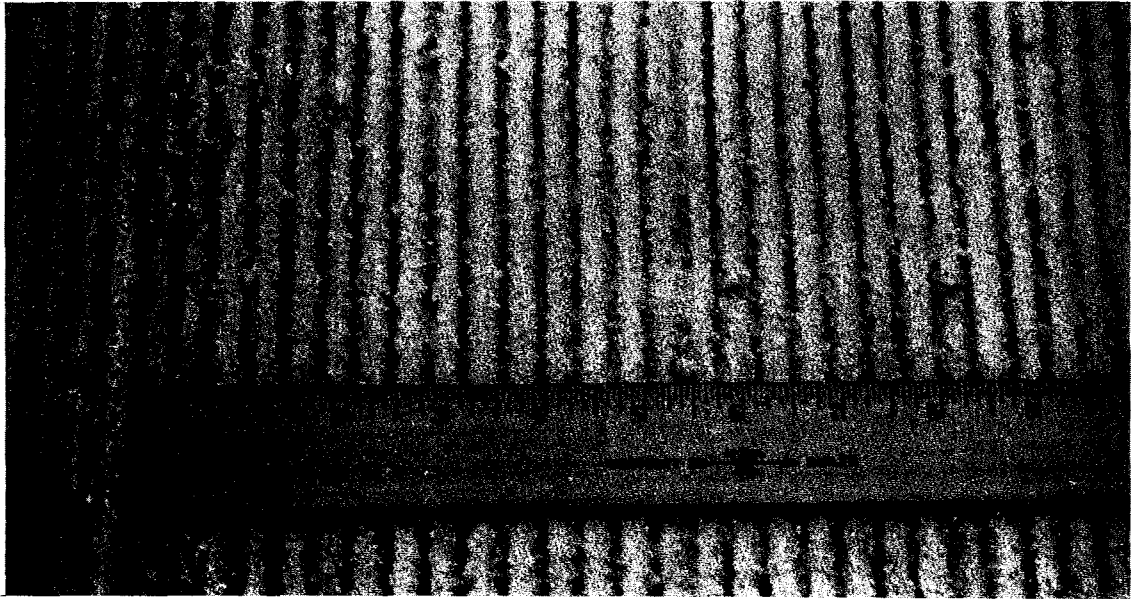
Test Section F-11: Burlap + 1/4 in.
